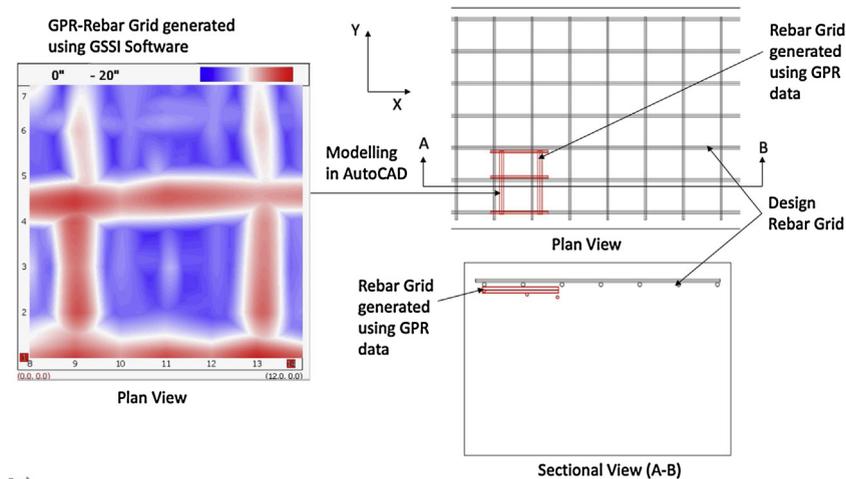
Rebar Grid generated using GPR data (RC Precast Girder at Surespan Structures).
